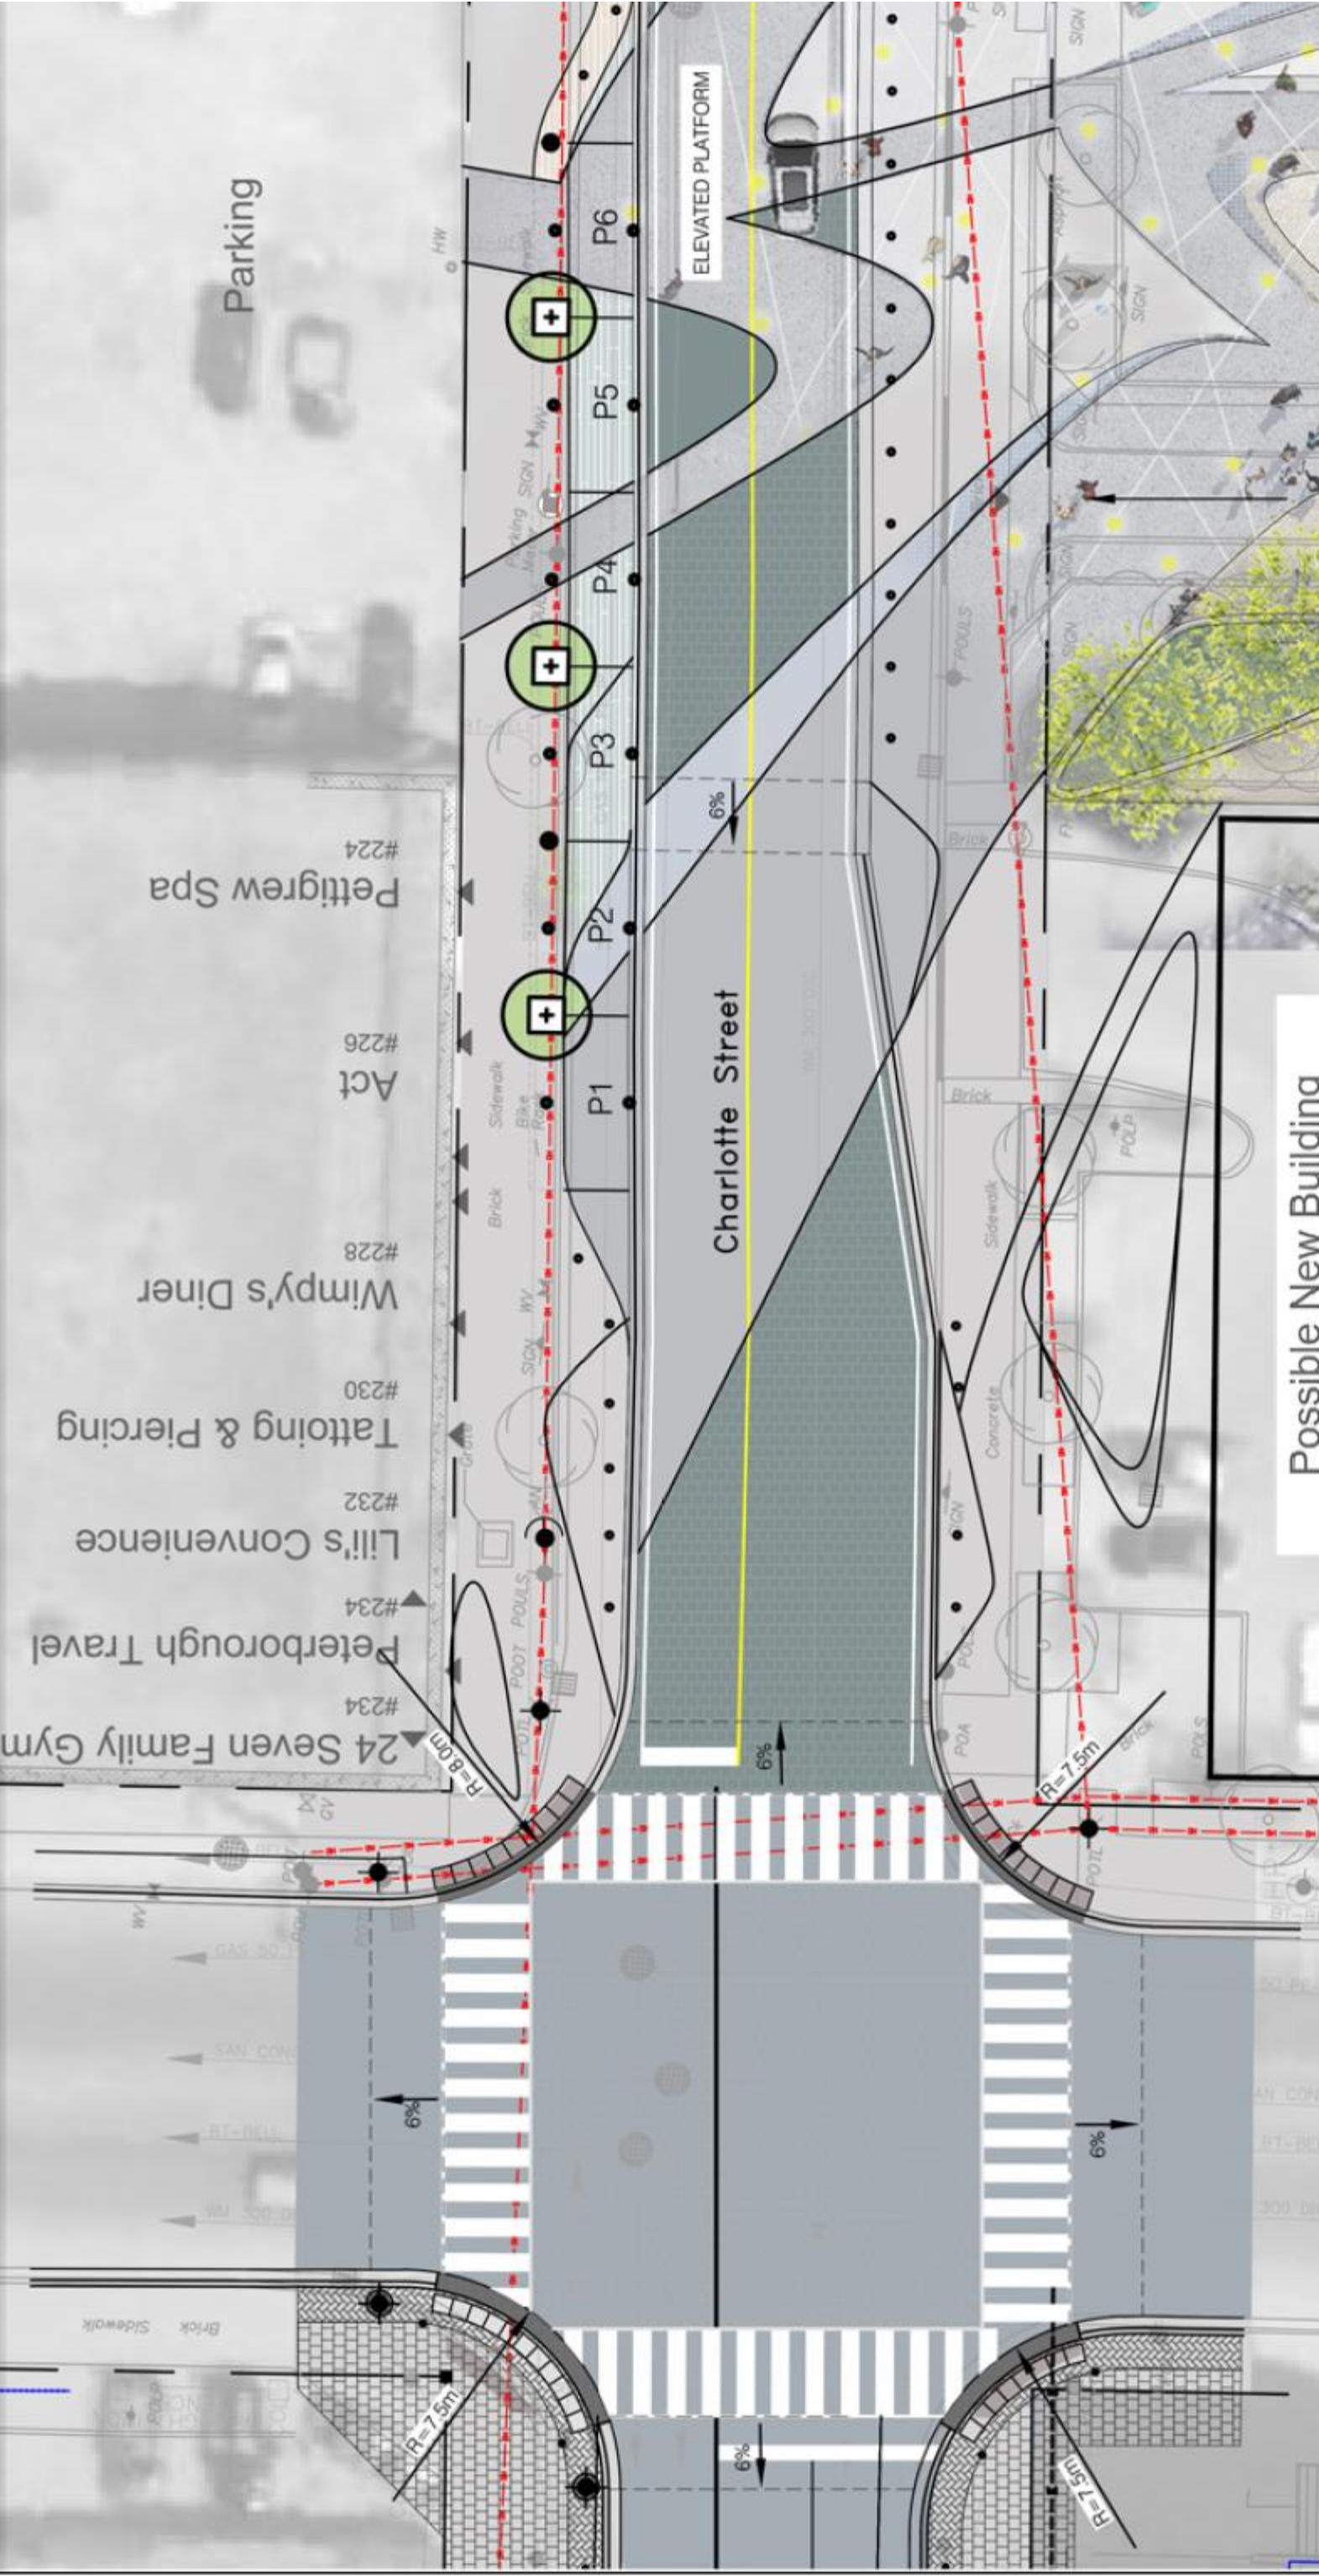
CHARLOTTE STREET PREFERRED CONCEPT PLAN (west section)
